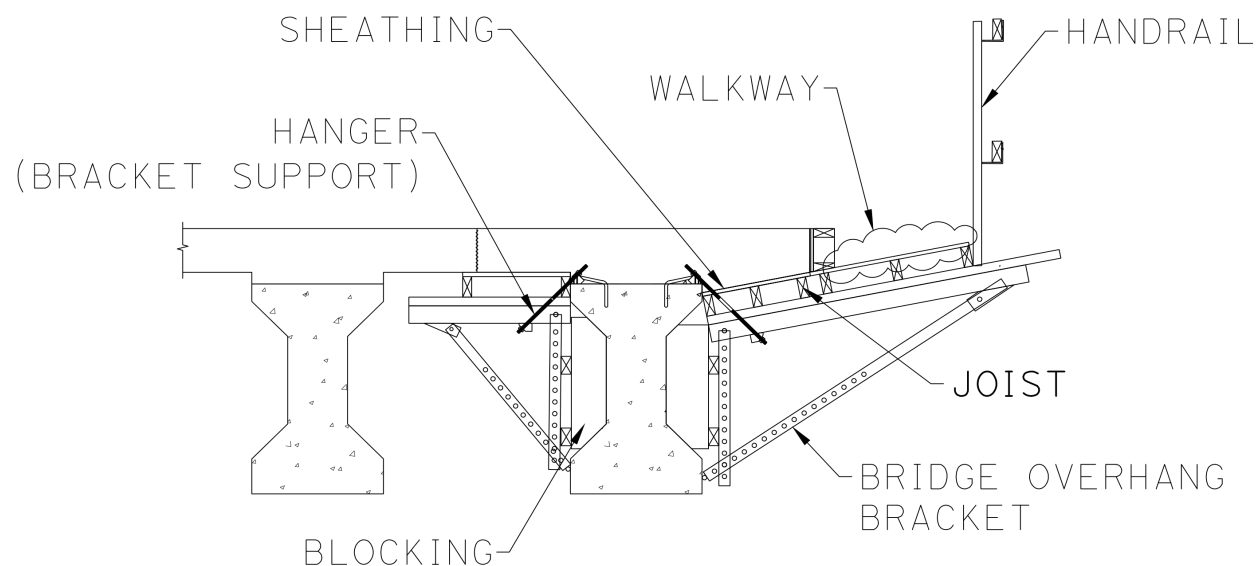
Precast Concrete Girder Overhang Formwork Detail
